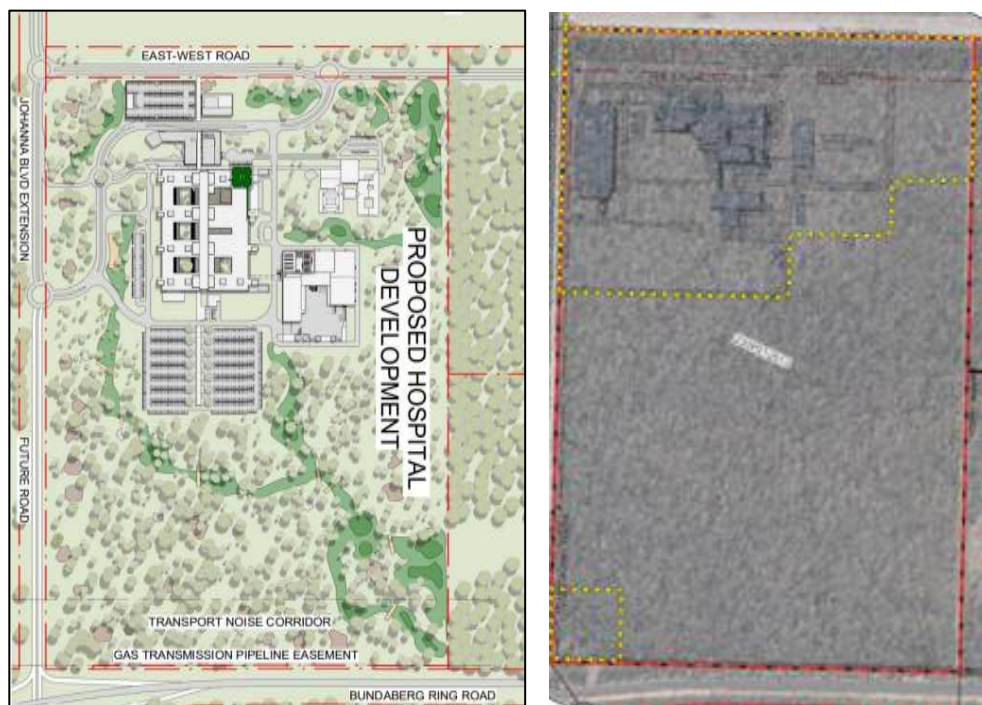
2020 Development Proposed Layout (left) and 2022 layout (right)
